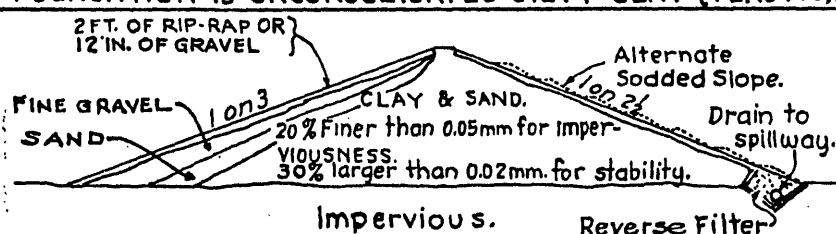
FIG. F - DESIGN FOR SITE WHERE CLAY & SAND ARE AVAILABLE - FOUNDATION REASONABLY IMPERVIOUS.†
